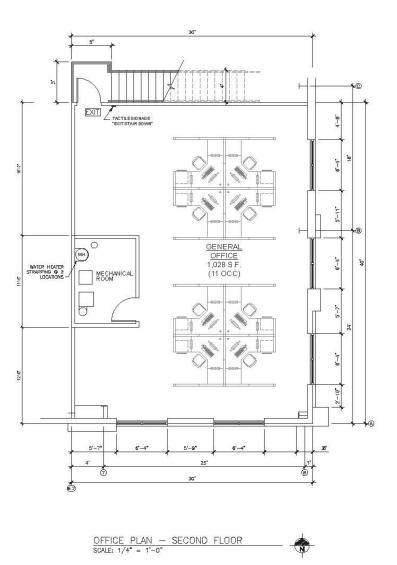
Conceptual Office Floor Plan Source: Van Dam Engineering
